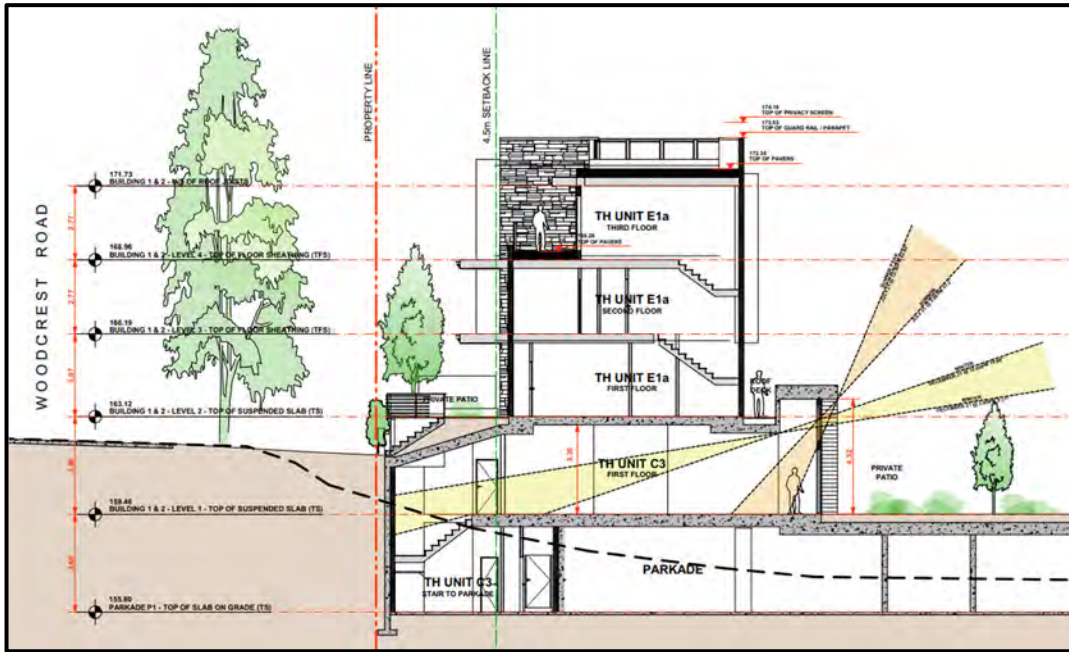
Site section showing Woodcrest Road interface and storeys above parkade
